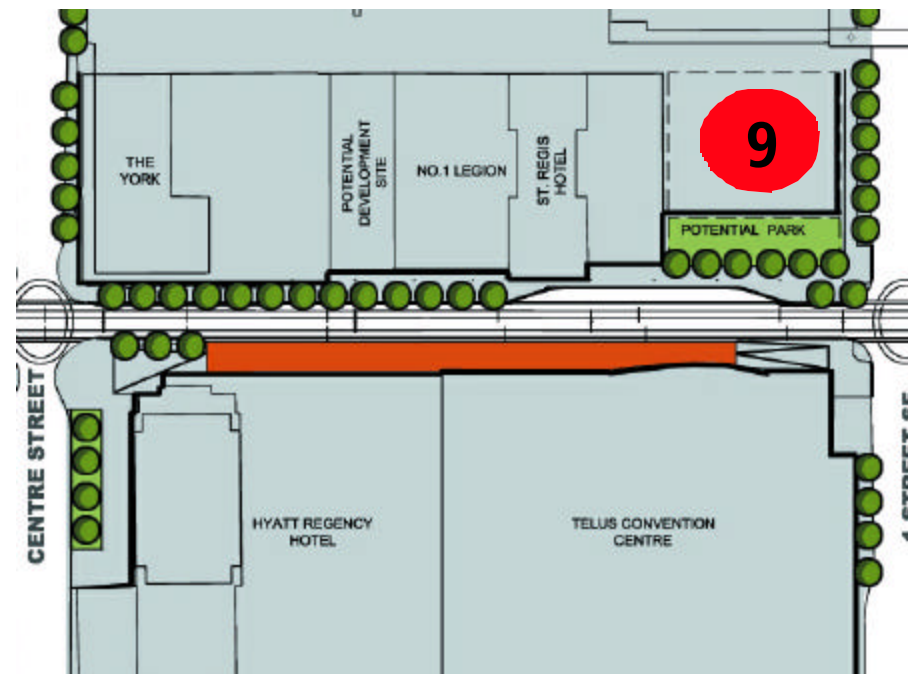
, Site 9 on the Northeast corner of 1st Street East and 7th Avenue (Block L)
